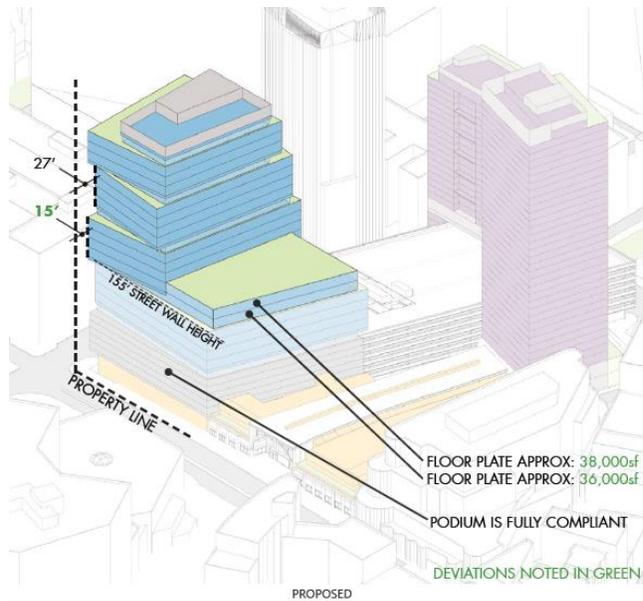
Preferred Alternative design of Garage West building used in Wind Tunnel Testing on April, 2016
